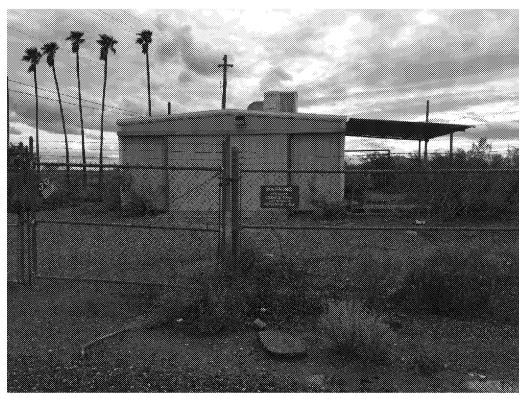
OU-4, SS024 - Building 1010 and Fence Signage
